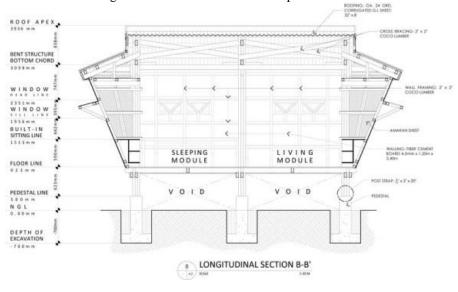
Longitudinal Cross Section of the Proposed Shelter.
